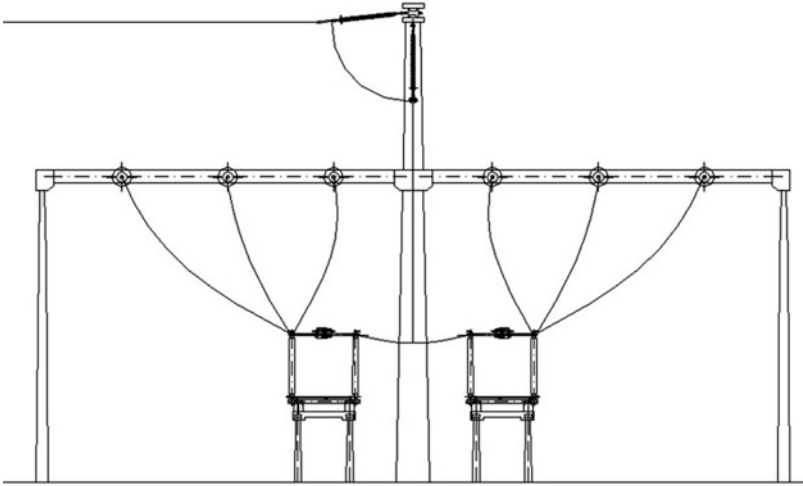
Connection with classic disconnector to flexible connection: elevation drawing (Carlos 1991)
